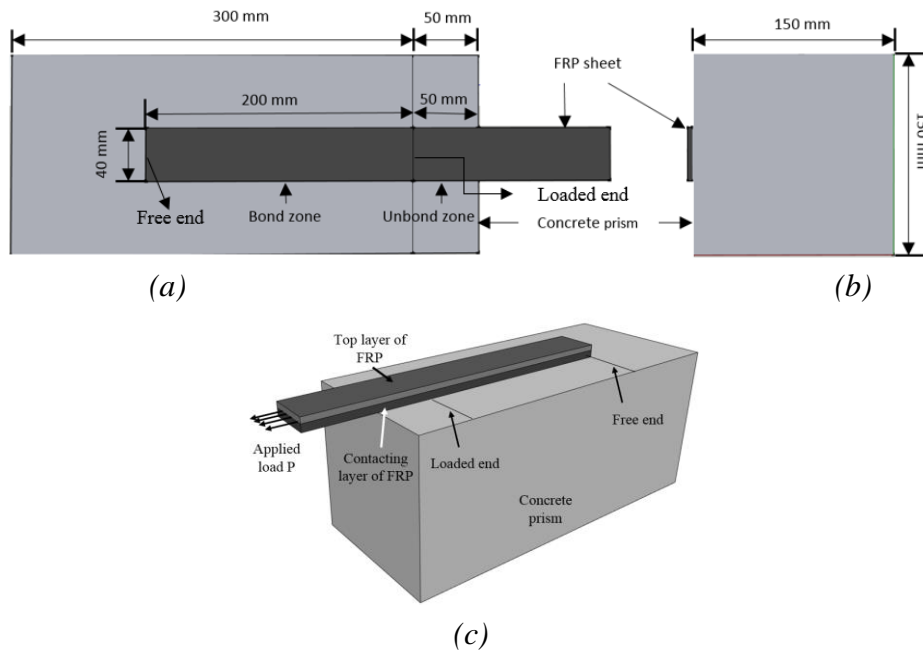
Scheme of single-lap shear specimen (a) front view; (b) side view; (c) 3D view
